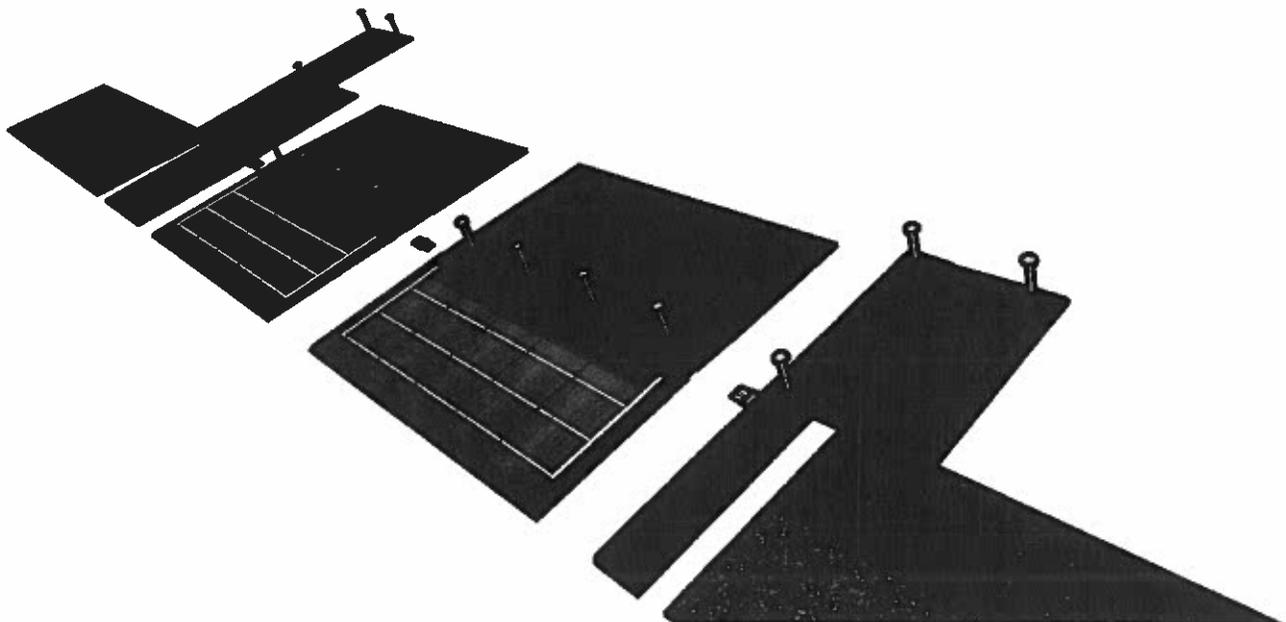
TYPICAL INSTALLATION DETAIL – INTEGRATION OF DOW POWERHOUSE™ SOLAR SHINGLES
